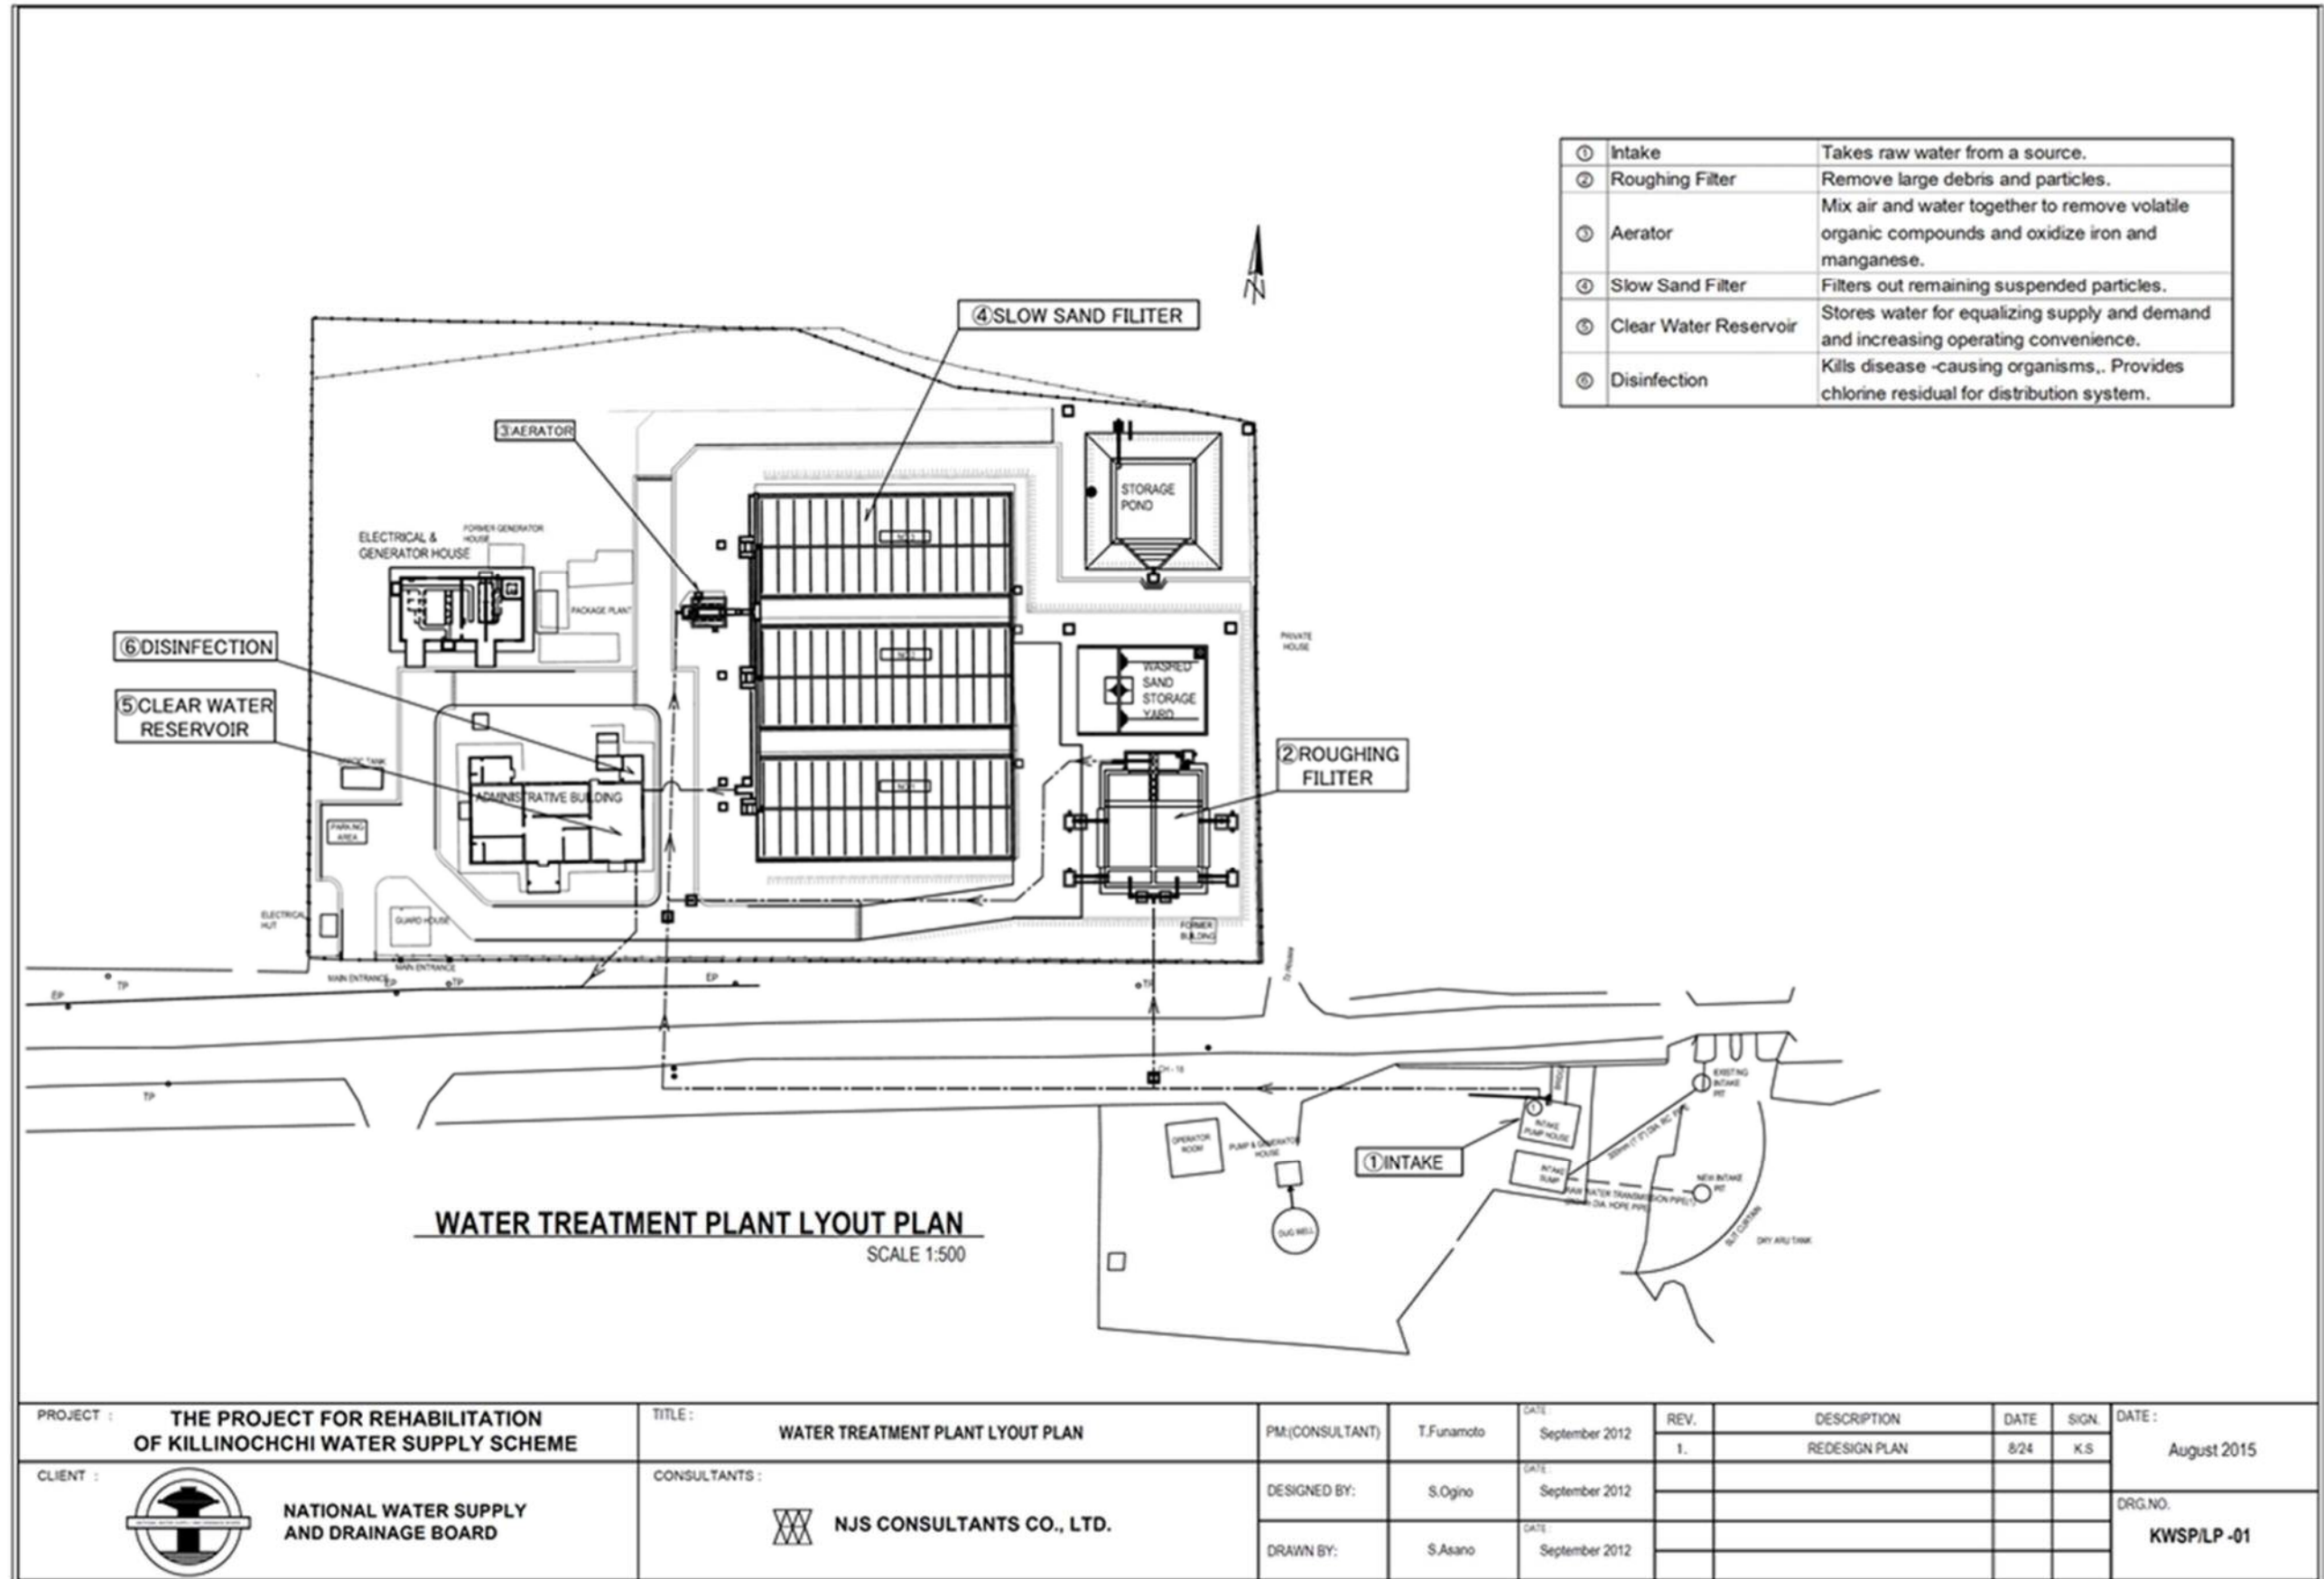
Layout Plan of Killinochchi Water Treatment Plant
